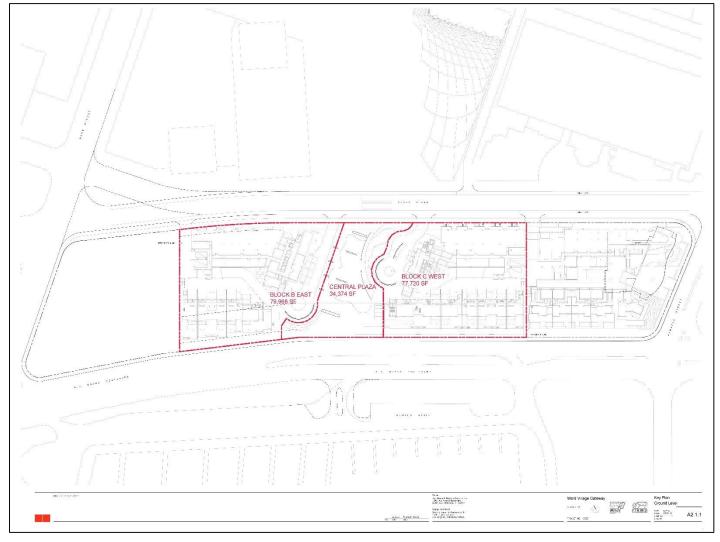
Project design showing the Ward Village Gateway building complex, straddling the Block B East and Block C West project areas, consisting of low-rise villas, residential towers, and commercial retail shops separated by a central plaza
